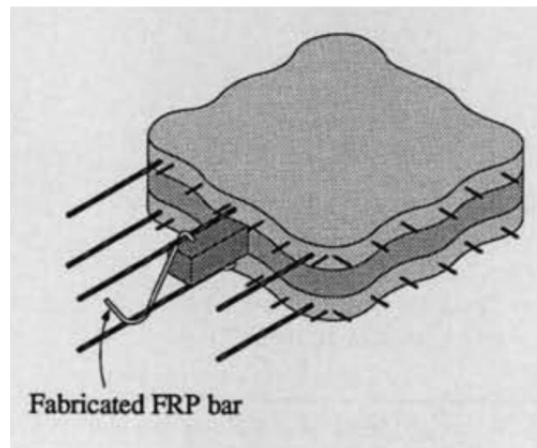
FRP Bent Bar Shear Connector* (PCI Committee on Precast Sandwich Wall Panels, 2011).
